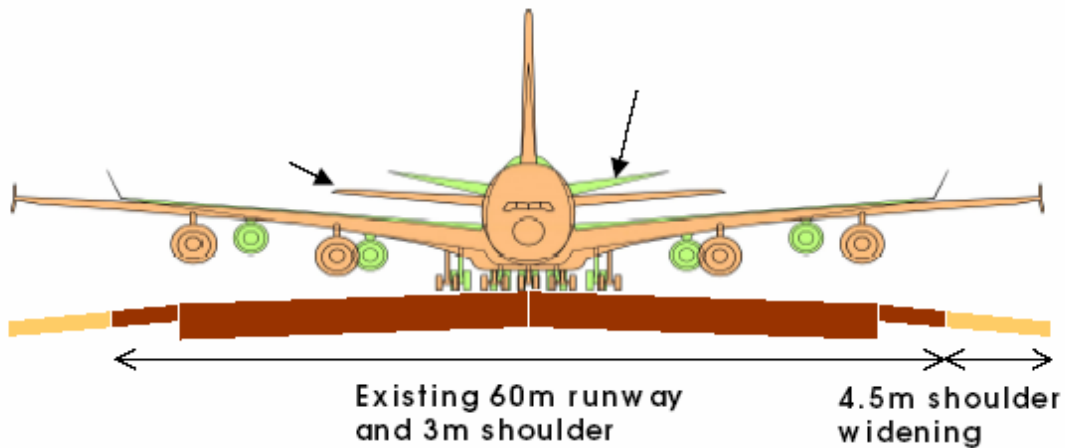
Runway shoulders widening at Singapore Changi Airport.
